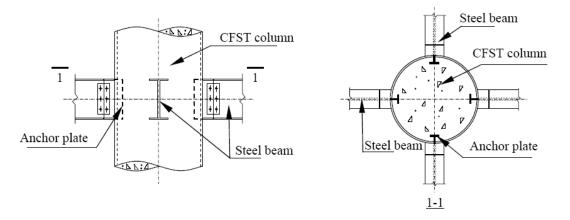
Typical connection used in SEG Plaza, Shenzhen, China
